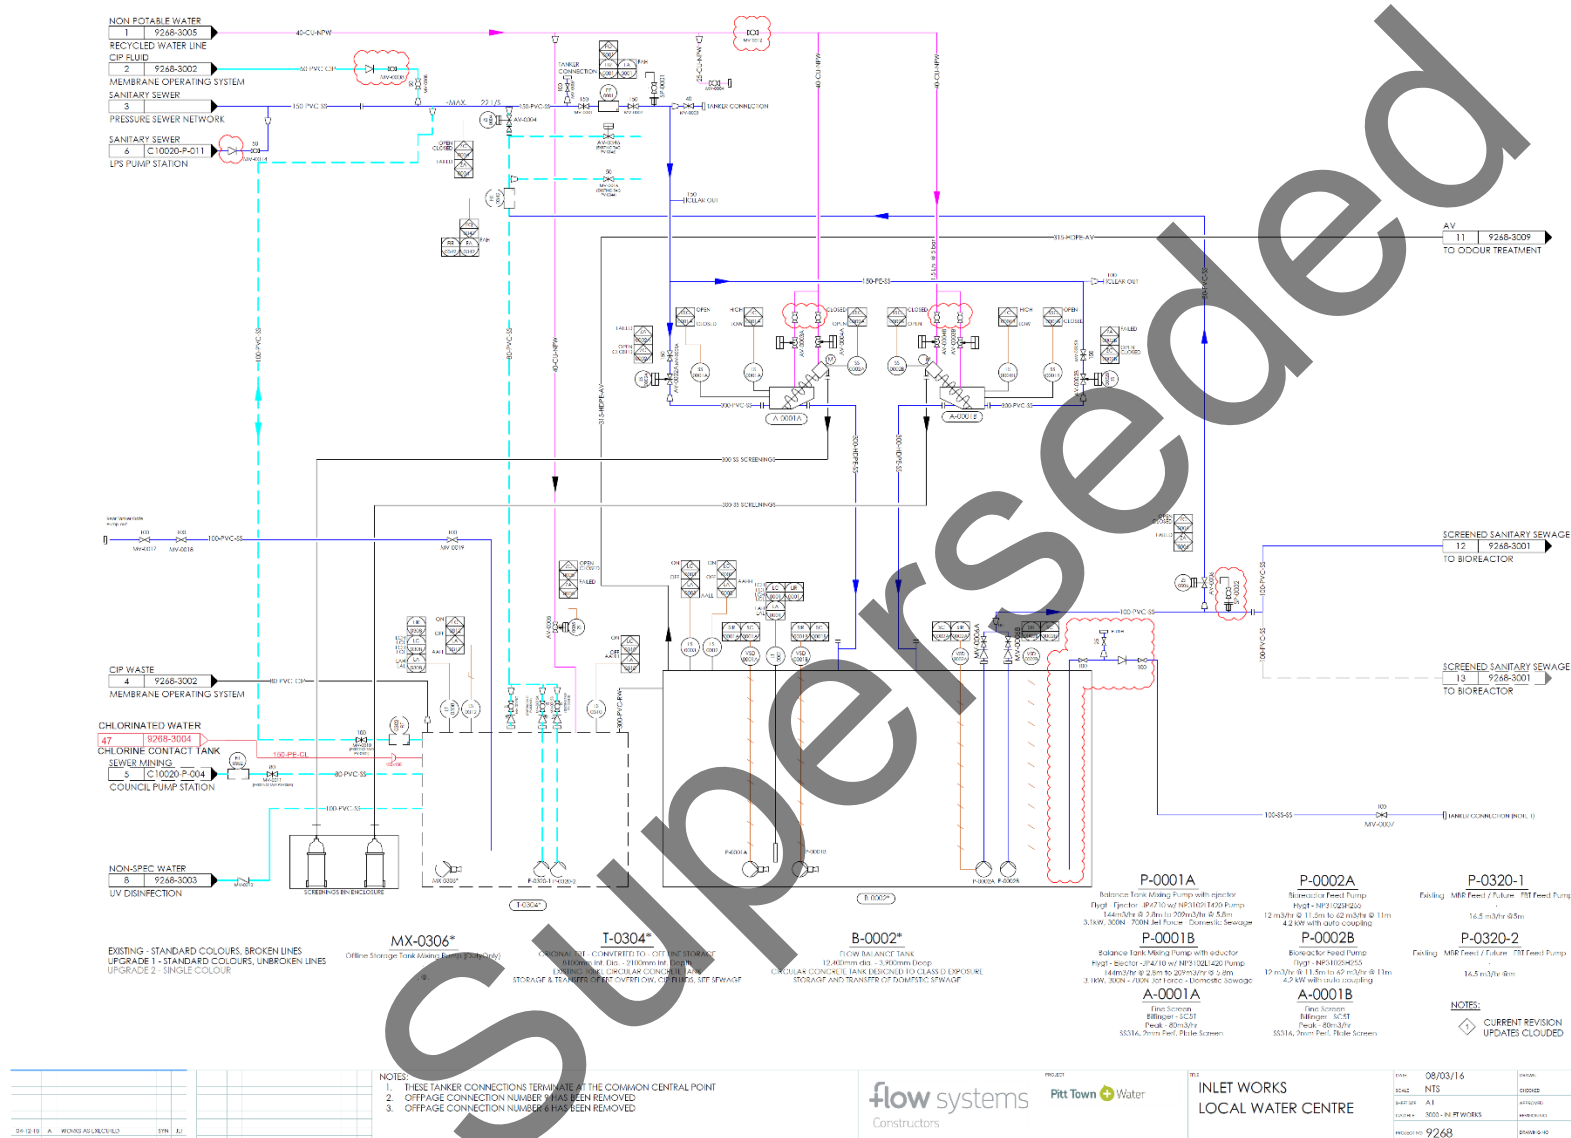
Pitt Town Water LWC inlet works P&ID with mark-ups of new infrastructures
